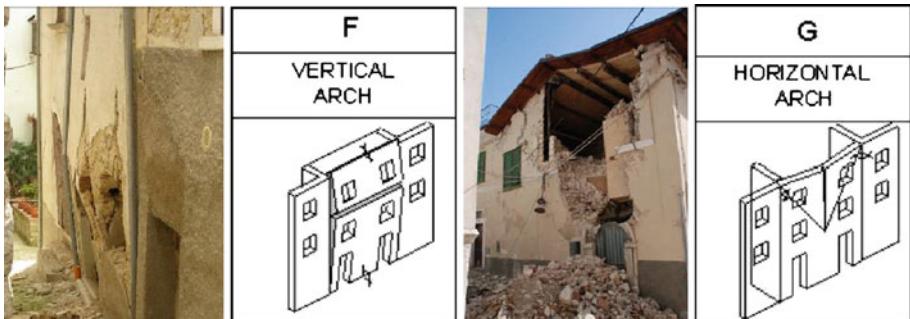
Damage mechanism F—vertical arch (left) and damage mechanism G—horizontal arch (right)
